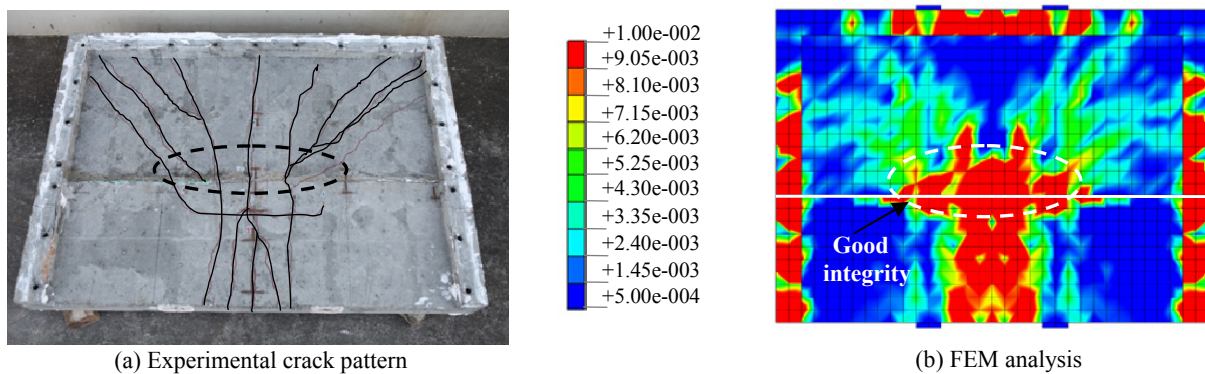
Principal tensile strain on the bottom surface of SL-P1.0.
